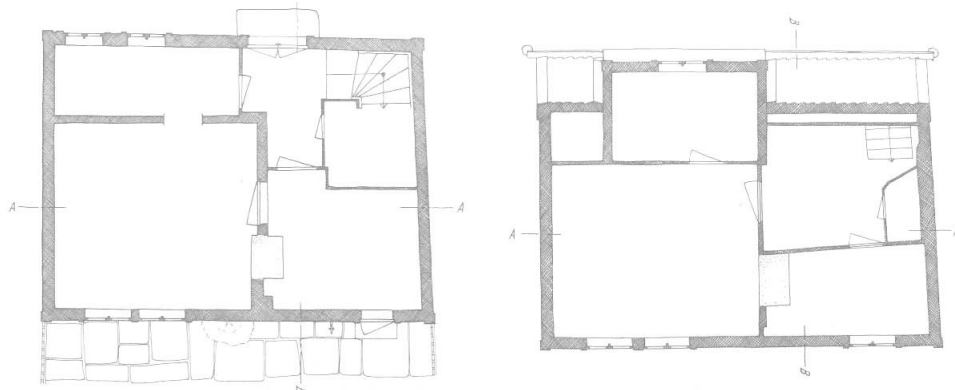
Fjæregrenden 16, floor plan for the ground floor (left) and upstairs (right). Original scale 1:50 November 1943. (Gamle Bergen Museum archives)
